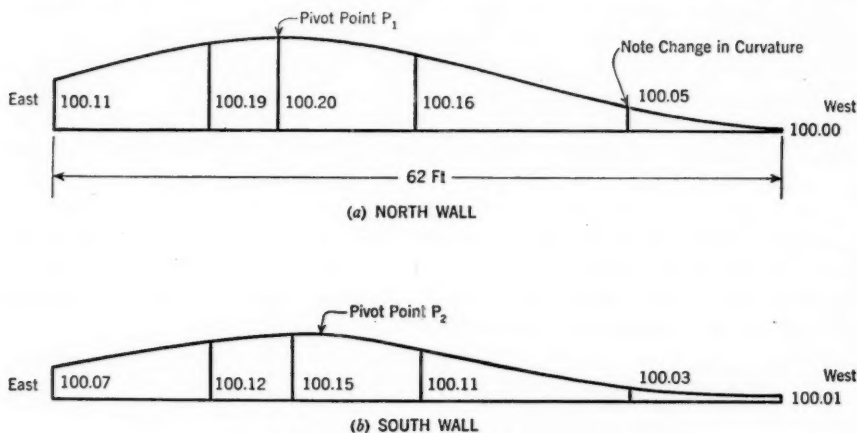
SETTLEMENT OF THE FOUNDATION
